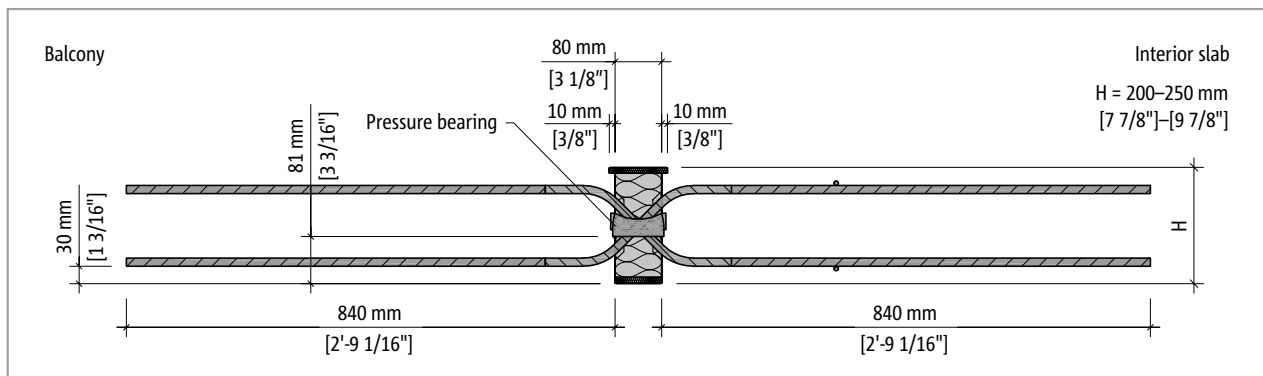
Schöck Isokorb® T Type CQ-VV12: Product cross-section
